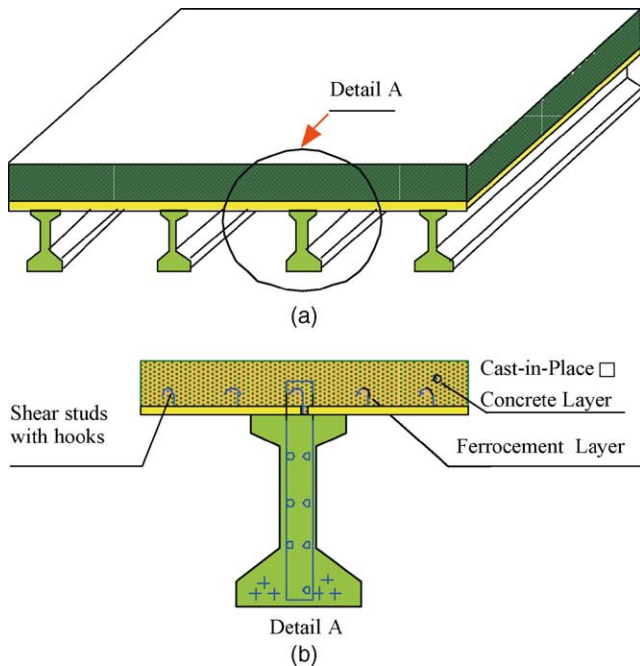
Proposed application of the ferrocement-concrete composite construction in bridge decks. (a) Composite bridge deck made of R/C and ferrocement. (b) Pre-stressed composite ferrocement-R/C bridge girder.
